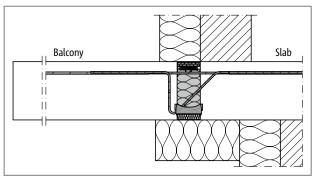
Schöck Isokorb® T type K: Connection with indirectly positioned floor and WDVS
